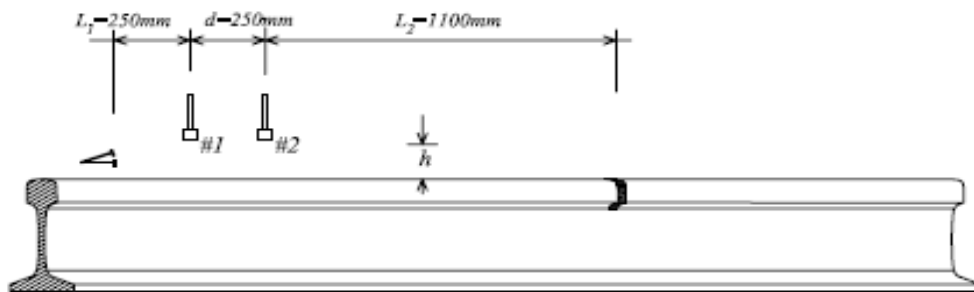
Crack detection using impact hammer actuator and air-coupled sensor [23]
